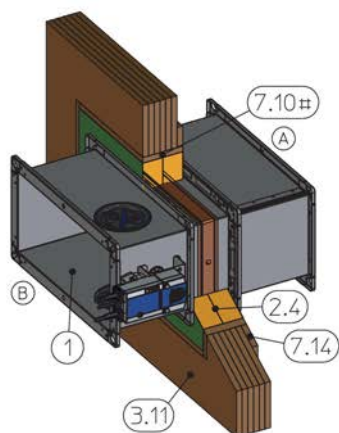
Dry mortarless installation into a solid wood wall or CLT wall, with installation kit ES
